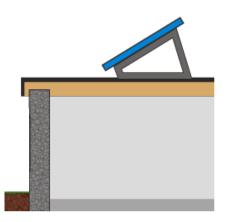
Flat Roof Installation (Horizon Renewables, 2013)
